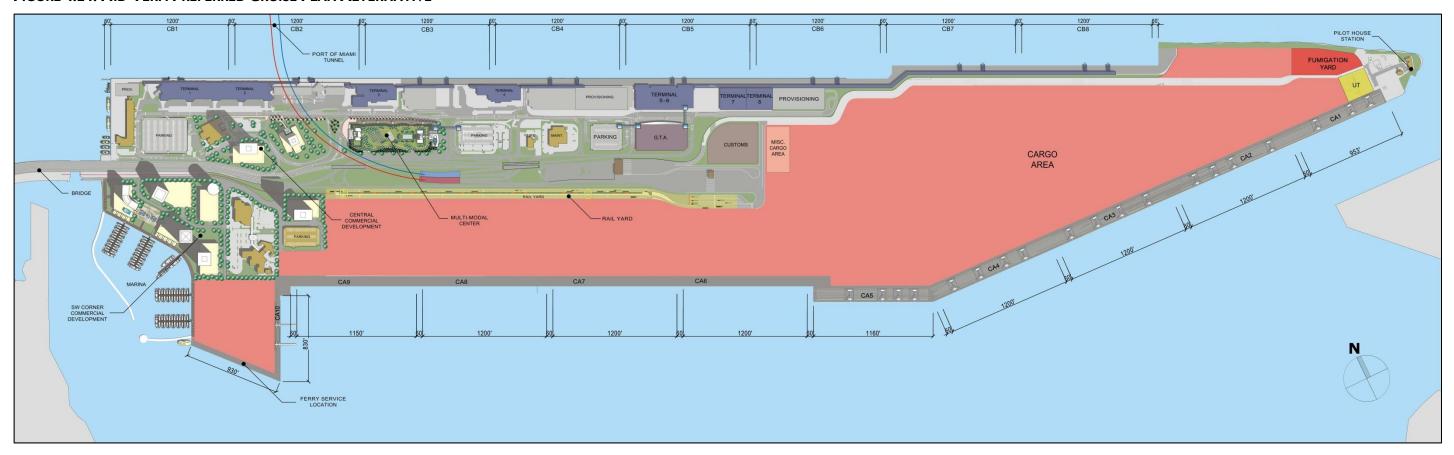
A: ALTERNATIVE CRUISE TERMINAL PLAN
